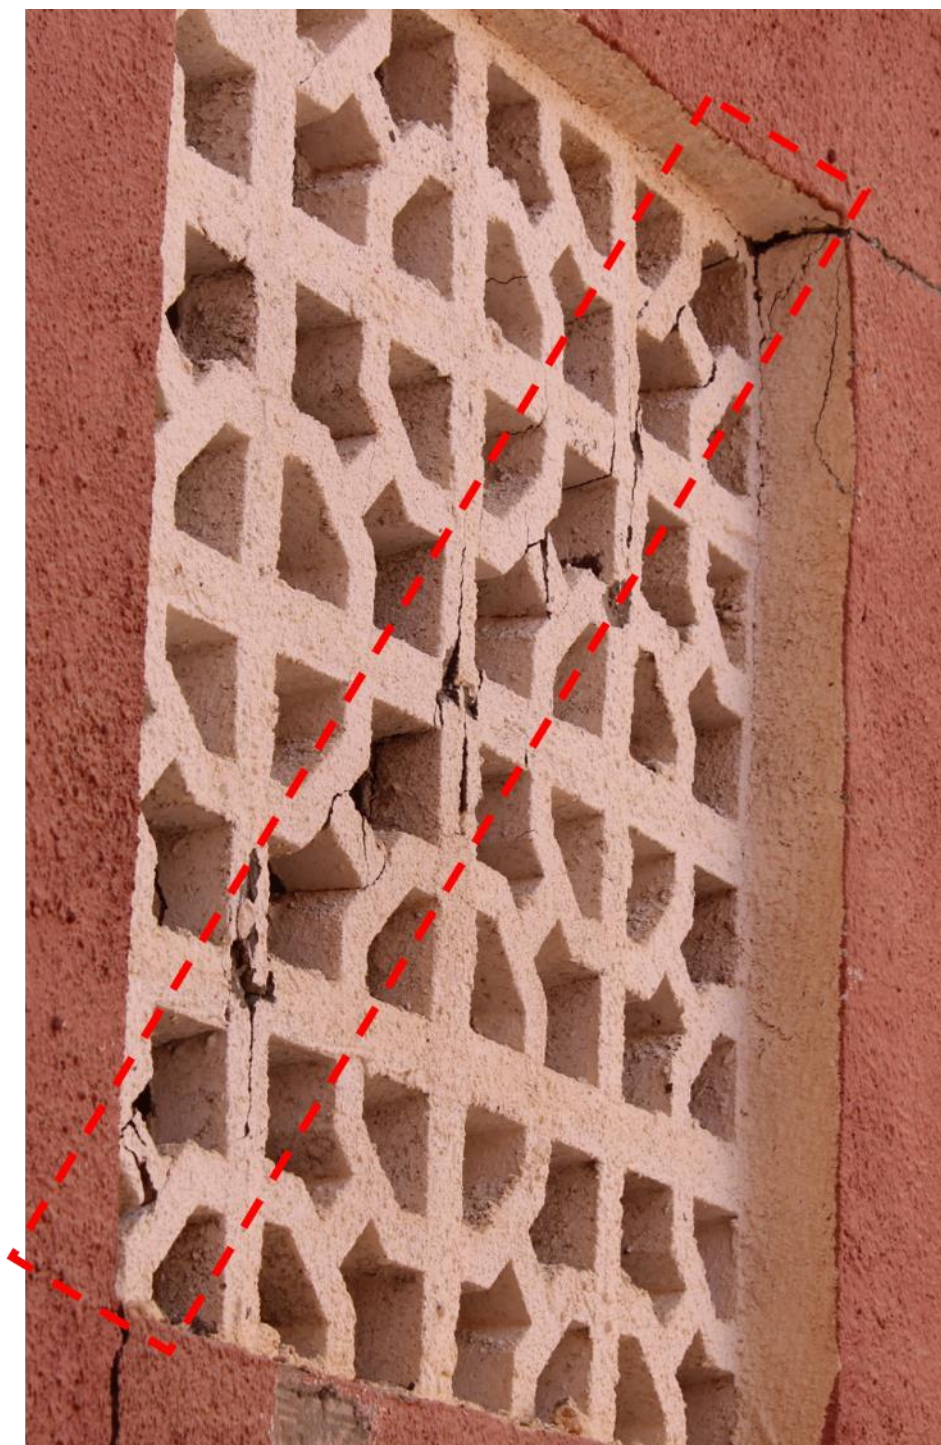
Diagonal decorative perforated concrete panel cracking recorded on building 8 of Area 1.
